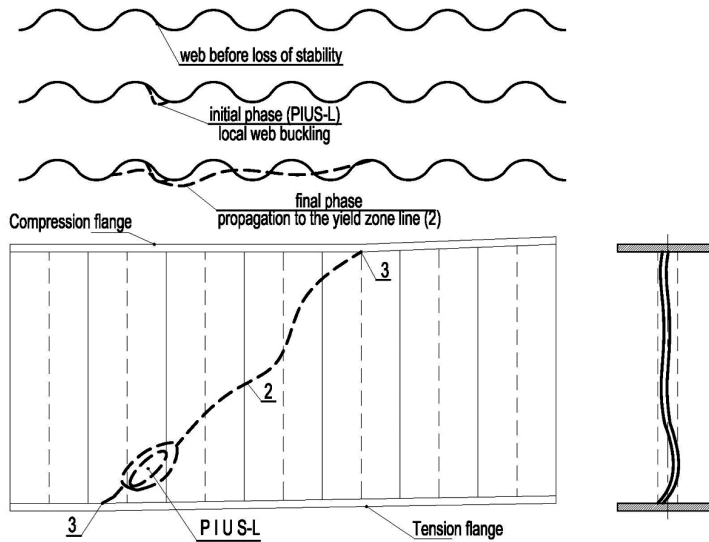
Scheme of local instability of the sine wave girders with support stiffeners
